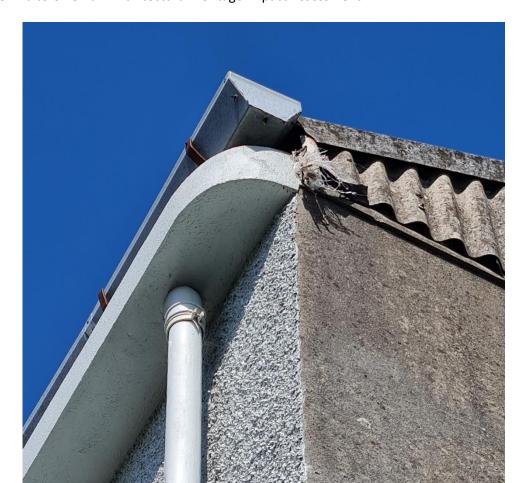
Detail of corrugated asbestos roof sheeting on south-west gable of auditorium block. The cast concrete projecting eaves is an important feature of the building, to be protected and retained as part of the work.
